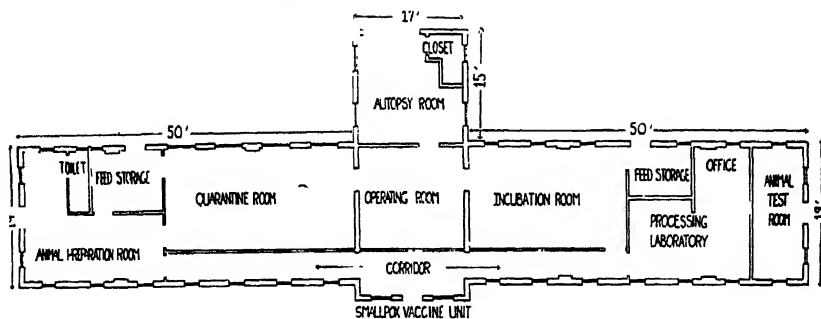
Floor plan of building used for production of smallpox vaccine.
